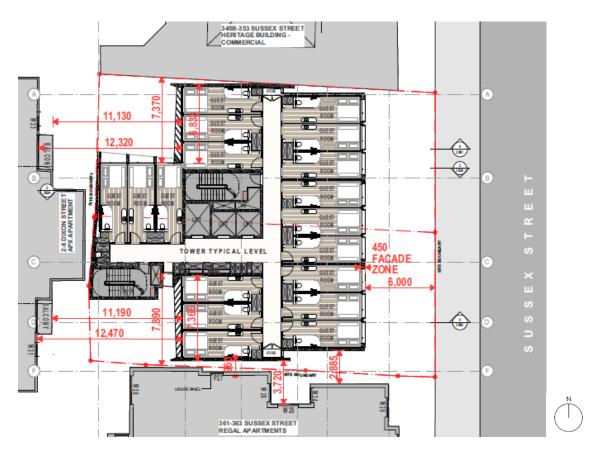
Proposed Typical Tower Floor Plan (Levels 7 - 16)
